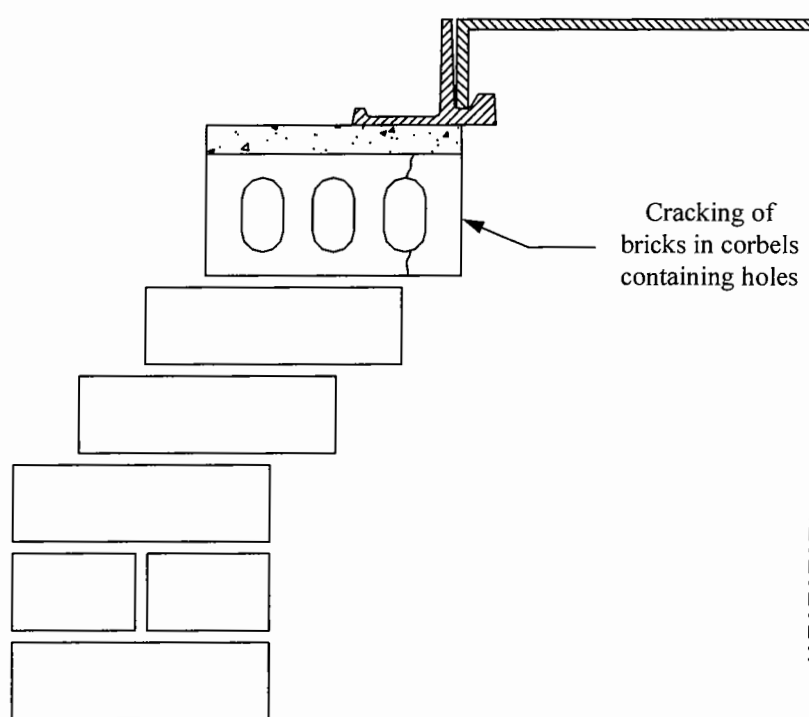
Section through a manhole chamber illustrating a brickwork corbel
